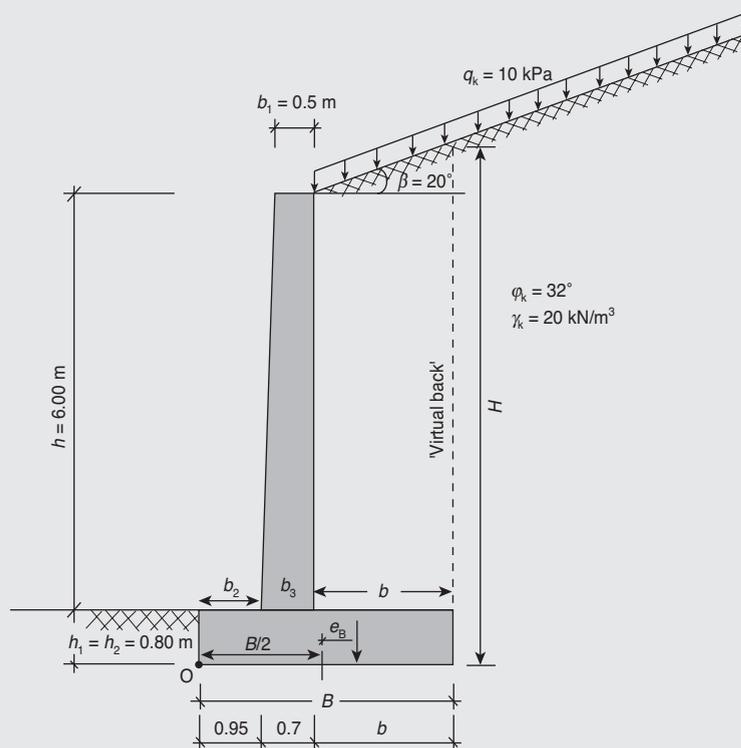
Geometrical data for a concrete stem (gravity) wall
